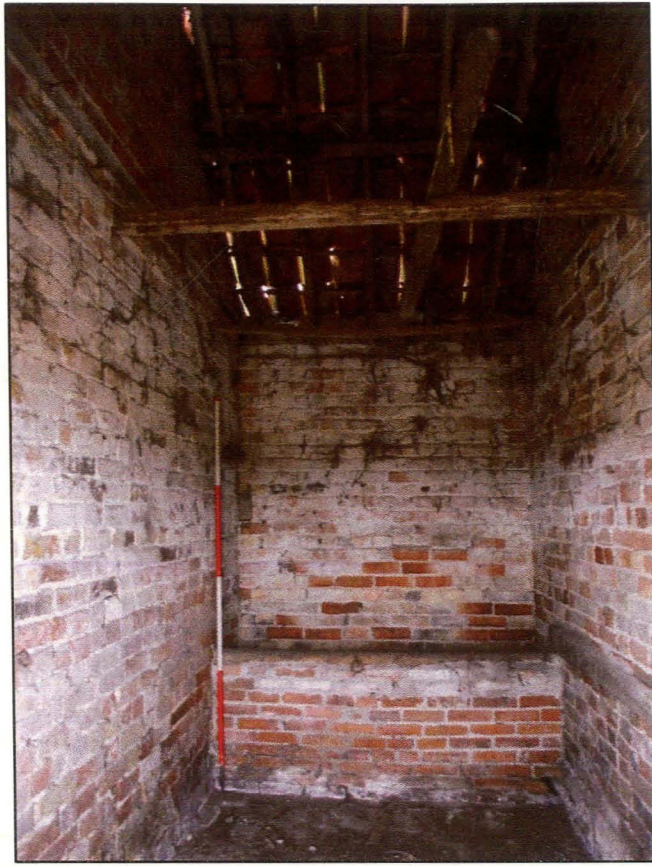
(Shot 81): Barn B10 showing feeding trough. Wooden beams have been installed to perhaps offer wall support. Looking west-south-west
